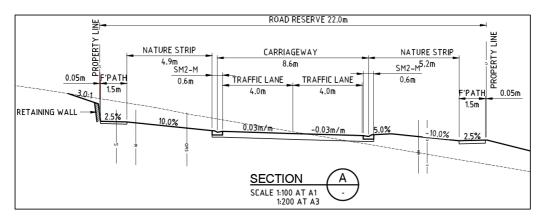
Proposed Cross Section - Extension of Fullarton Drive
